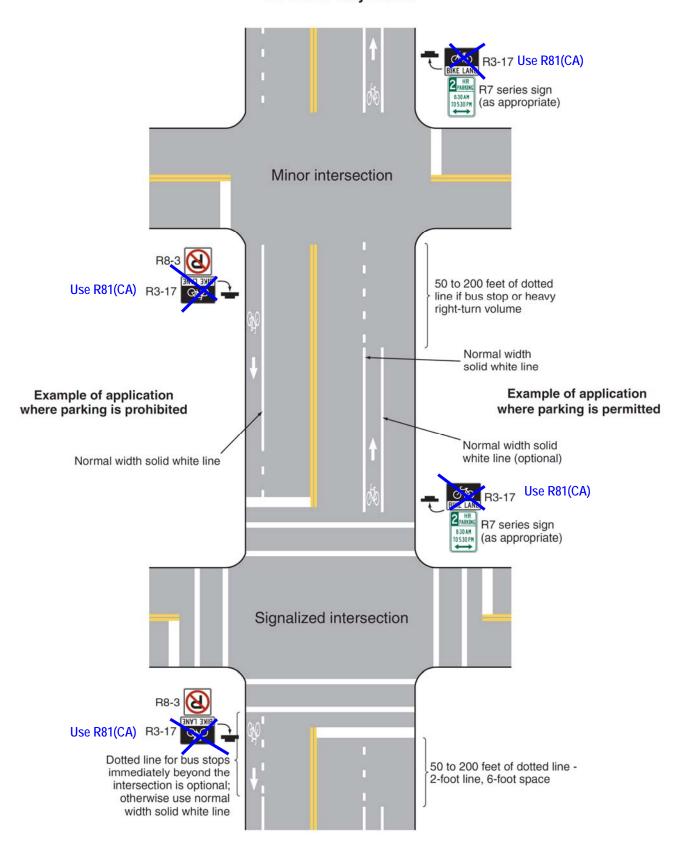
C-6. Example of Pavement Markings for Bicycle Lanes on a Two-Way Street
